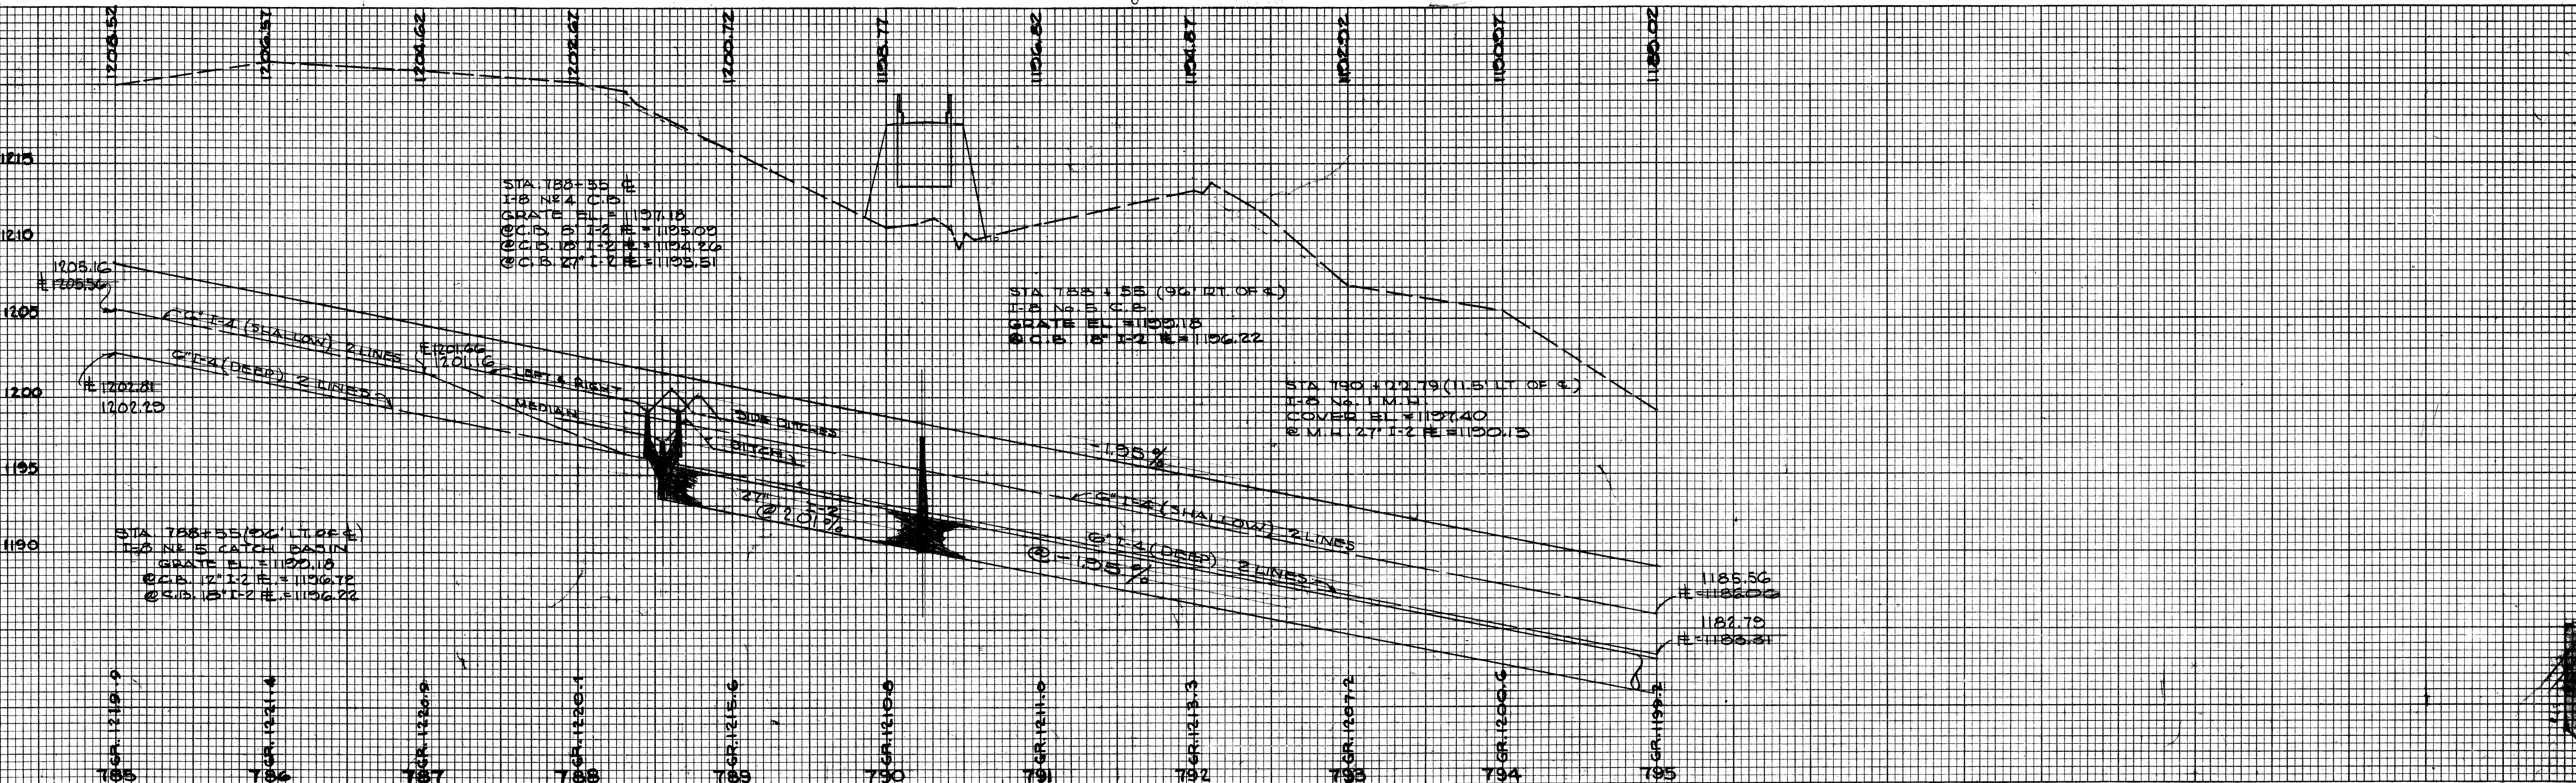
CROSS SECTION O.P.R.R.E. STANDARD KEUFFEL & ESSER CO., NEW YORK
